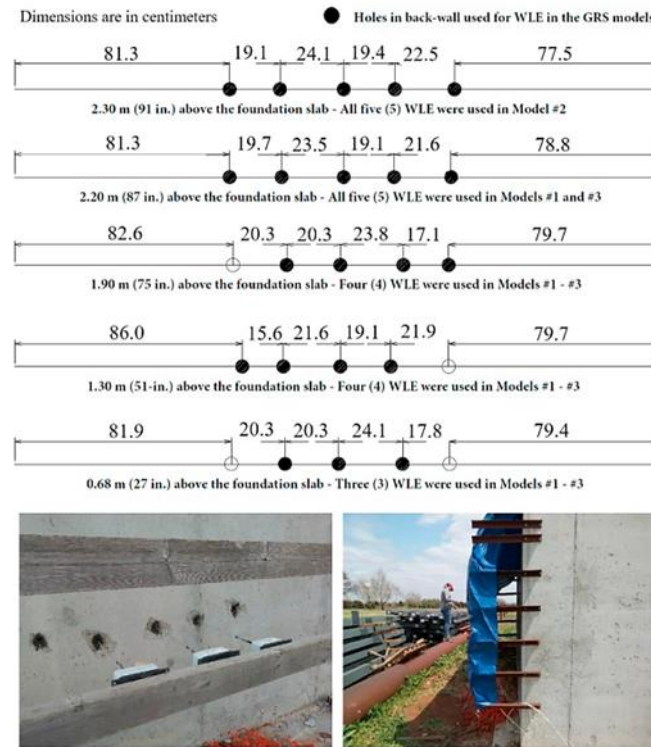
Holes in the rear wall of the test setup, wire-line extensometers, and hangers (Hatami & Doger, 2021)
